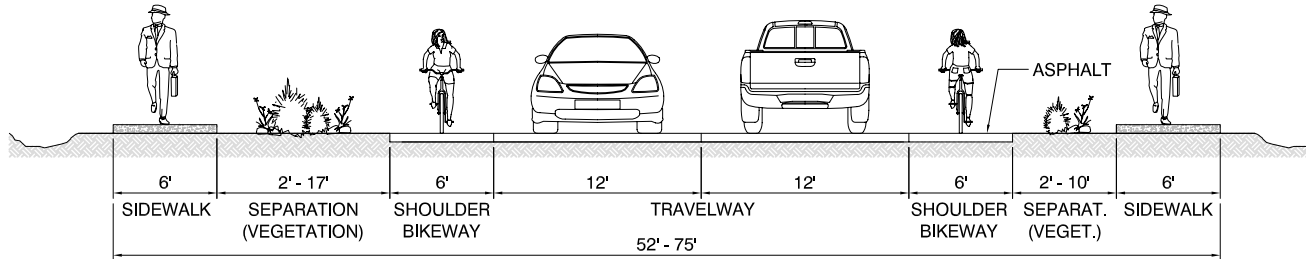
shows the preferred cross-section for the US 101 South section. As shown, the existing 36-foot paved section would be augmented with 6-foot sidewalks separated from the motor vehicle travel lanes and shoulder bike lanes by a vegetated strip. The right-of-way available along US 101 can accommodate a vegetated strip varying in width between 2 and 17 feet.
